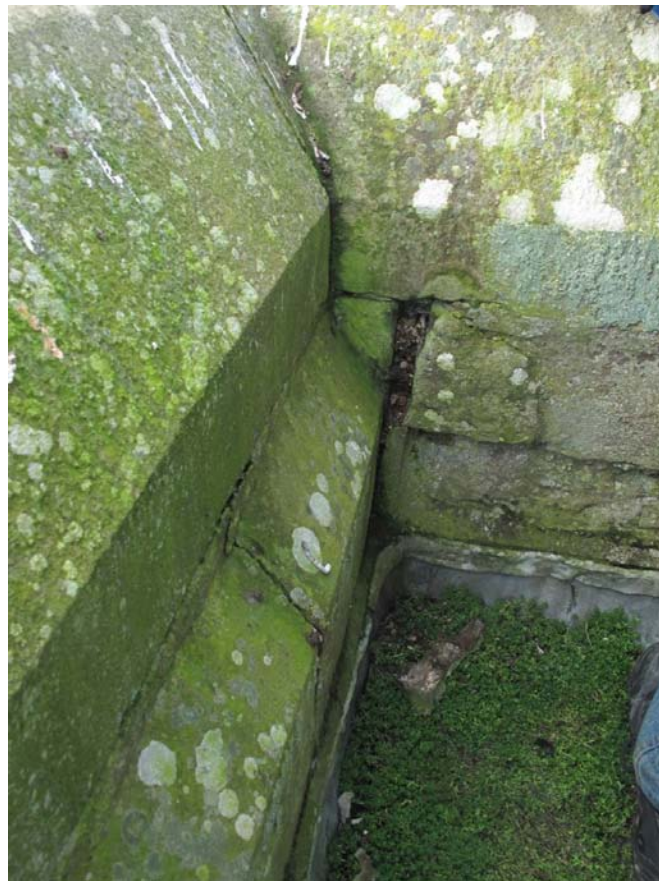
Cracking and open joints to parapets at the south west corner.
